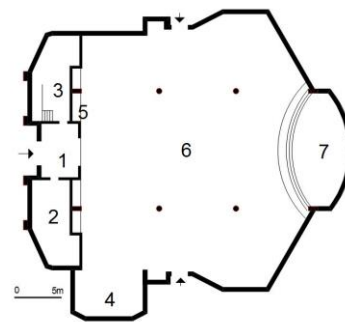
Ground floor plan. Legend: 1 - porch, 2 - sacristy, 3 - utility room, toilet, 4 - chapel, 5 - choir outline, 6 - nave, 7 - altar, source D. Janisio-Pawłowska
